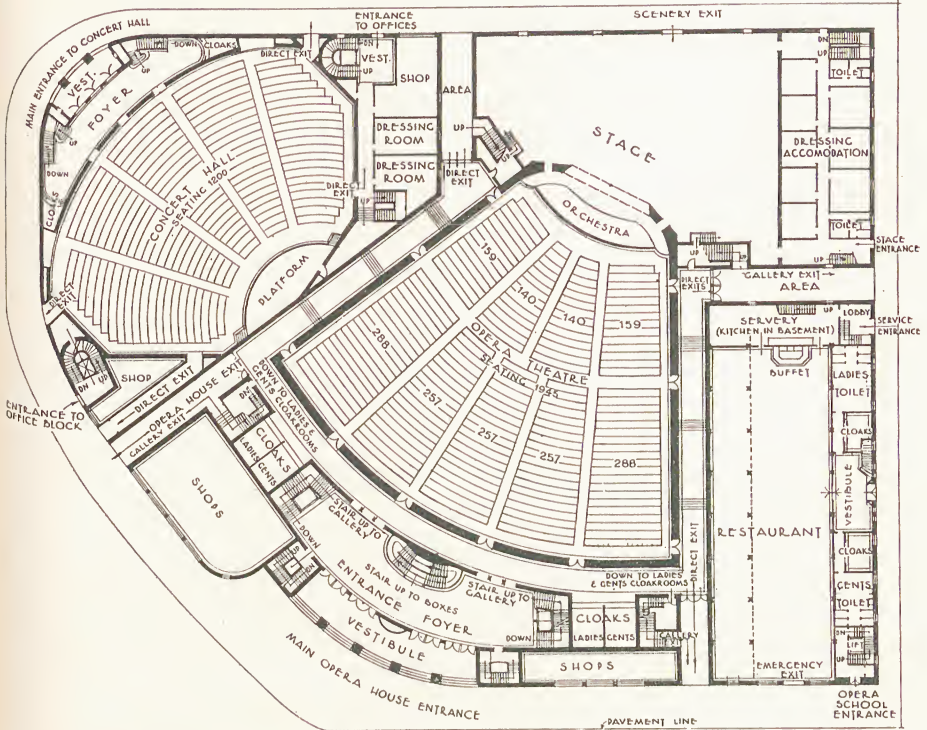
GROUND-FLOOR PLAN OF PROJECT FOR IMPERIAL MUSIC CENTRE
